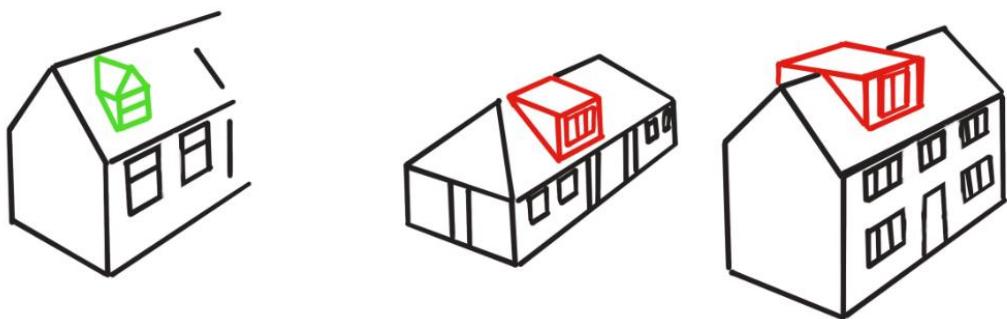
Good dormer design on left. Unsatisfactory dormer designs not fitting into roof form on right
